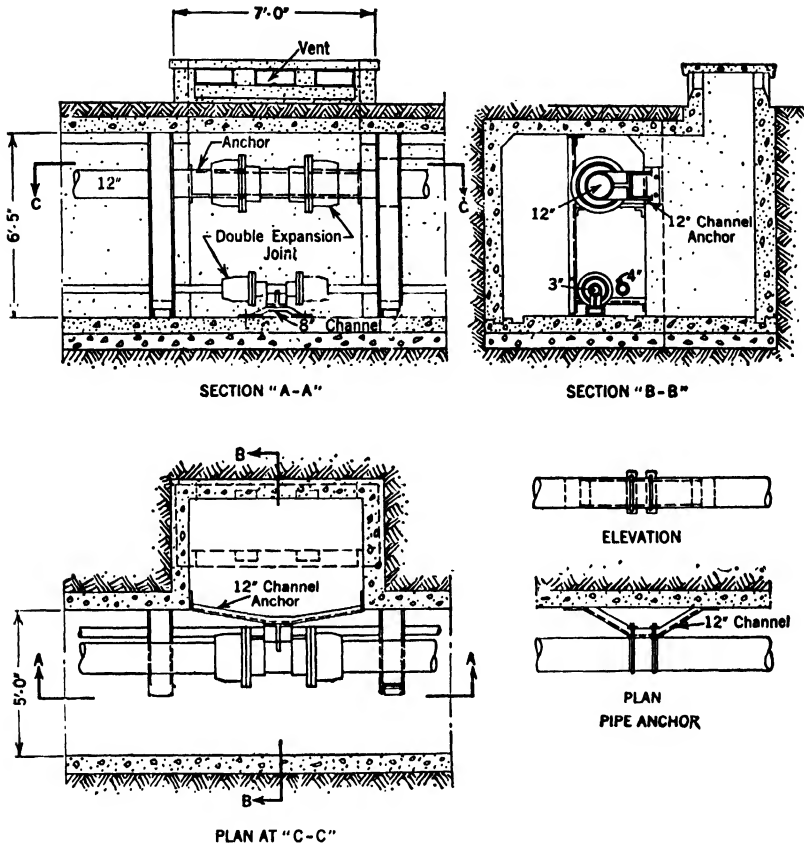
Expansion-joint and pipe-anchor details, University of Illinois.
